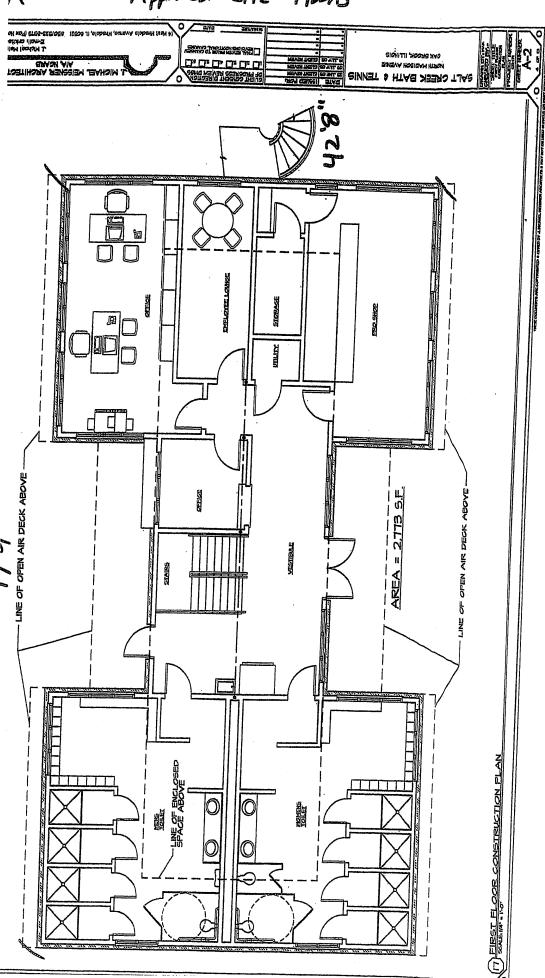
Exhibit B- Approved Detailed Plan Exhibit C- Approved Externor Appealance Plans
